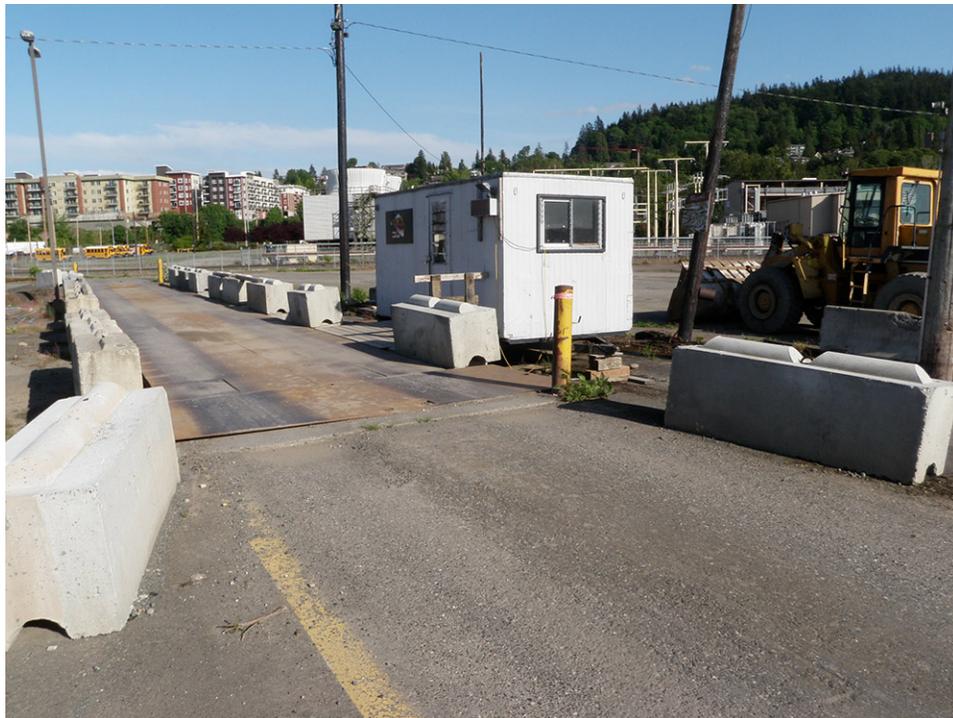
Former GP West SSA concrete reduction and sorting.
